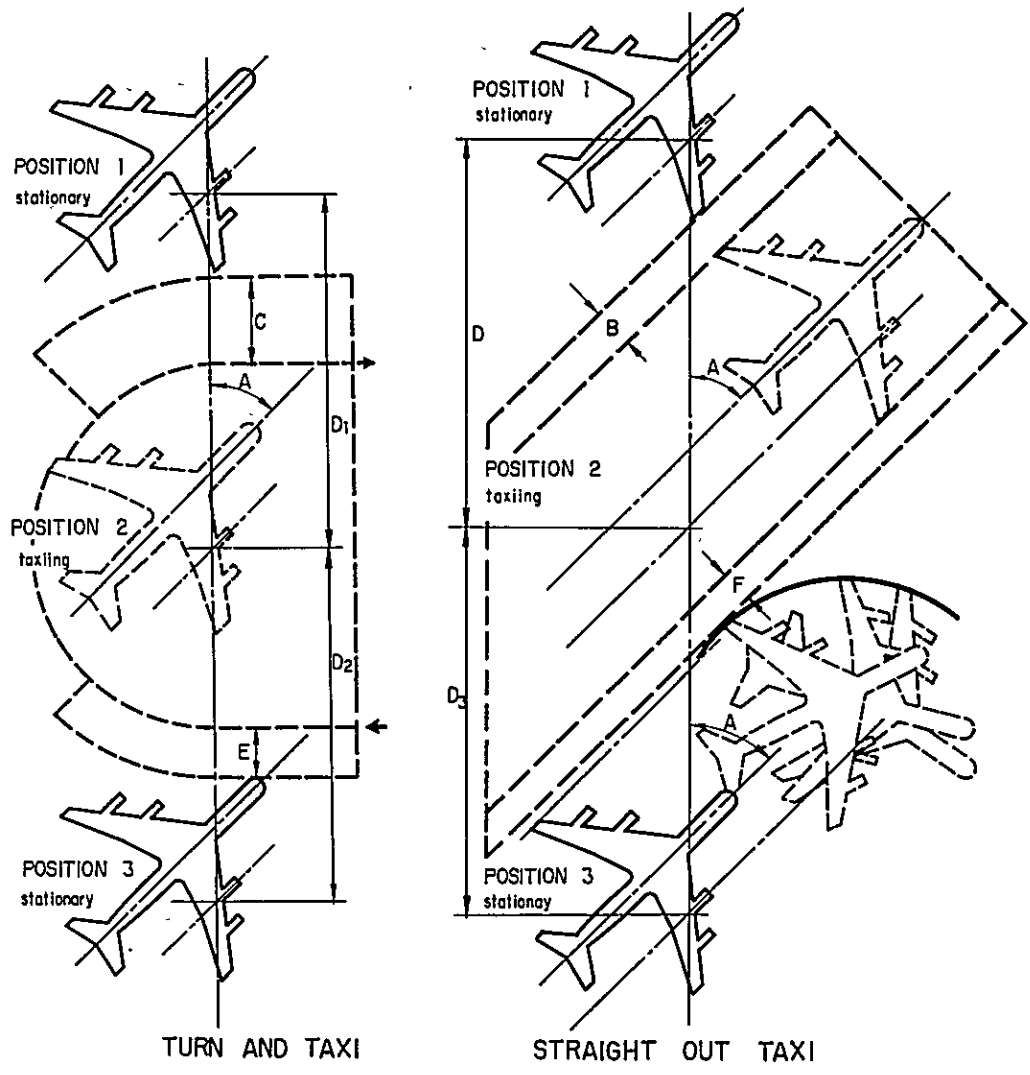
10 APRON PARKING CONFIGURATIONS
